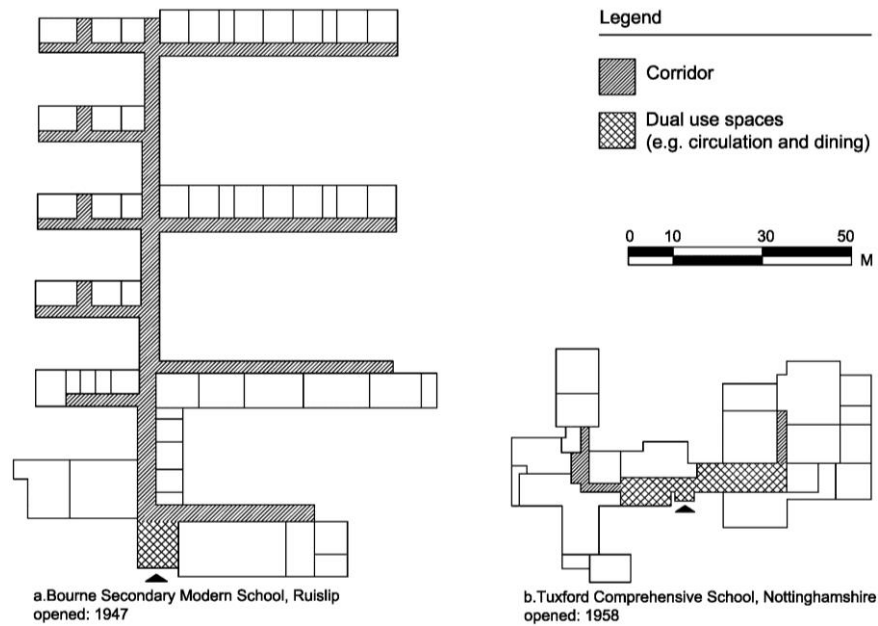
Diagrammatic plans: a. finger-plan and b. compact form (adapted from Maclure, 1984).
